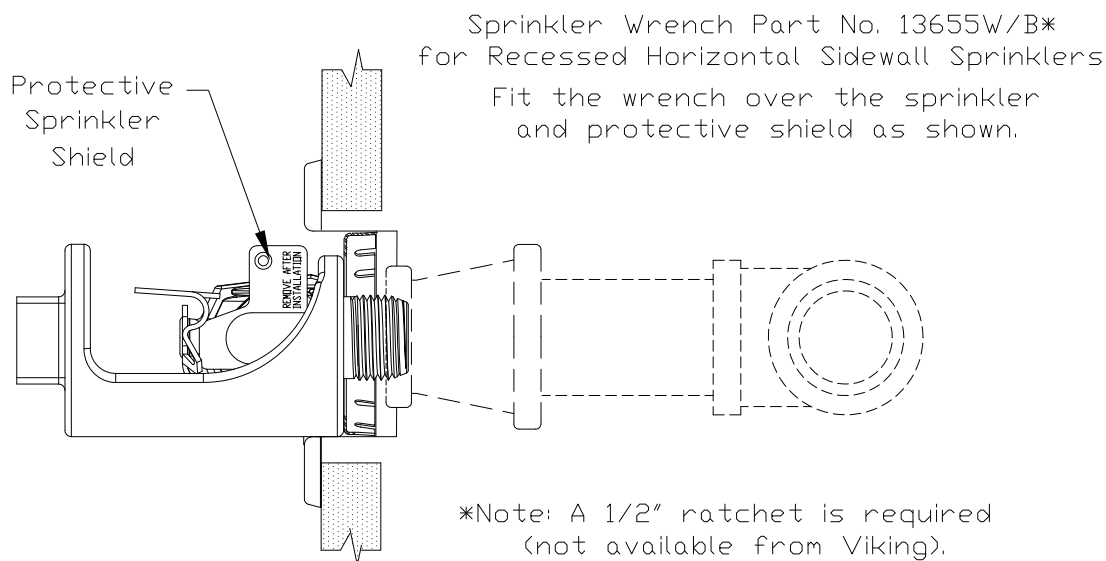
Wrench 13655W/B for Recessed Horizontal Sidewall Sprinklers
